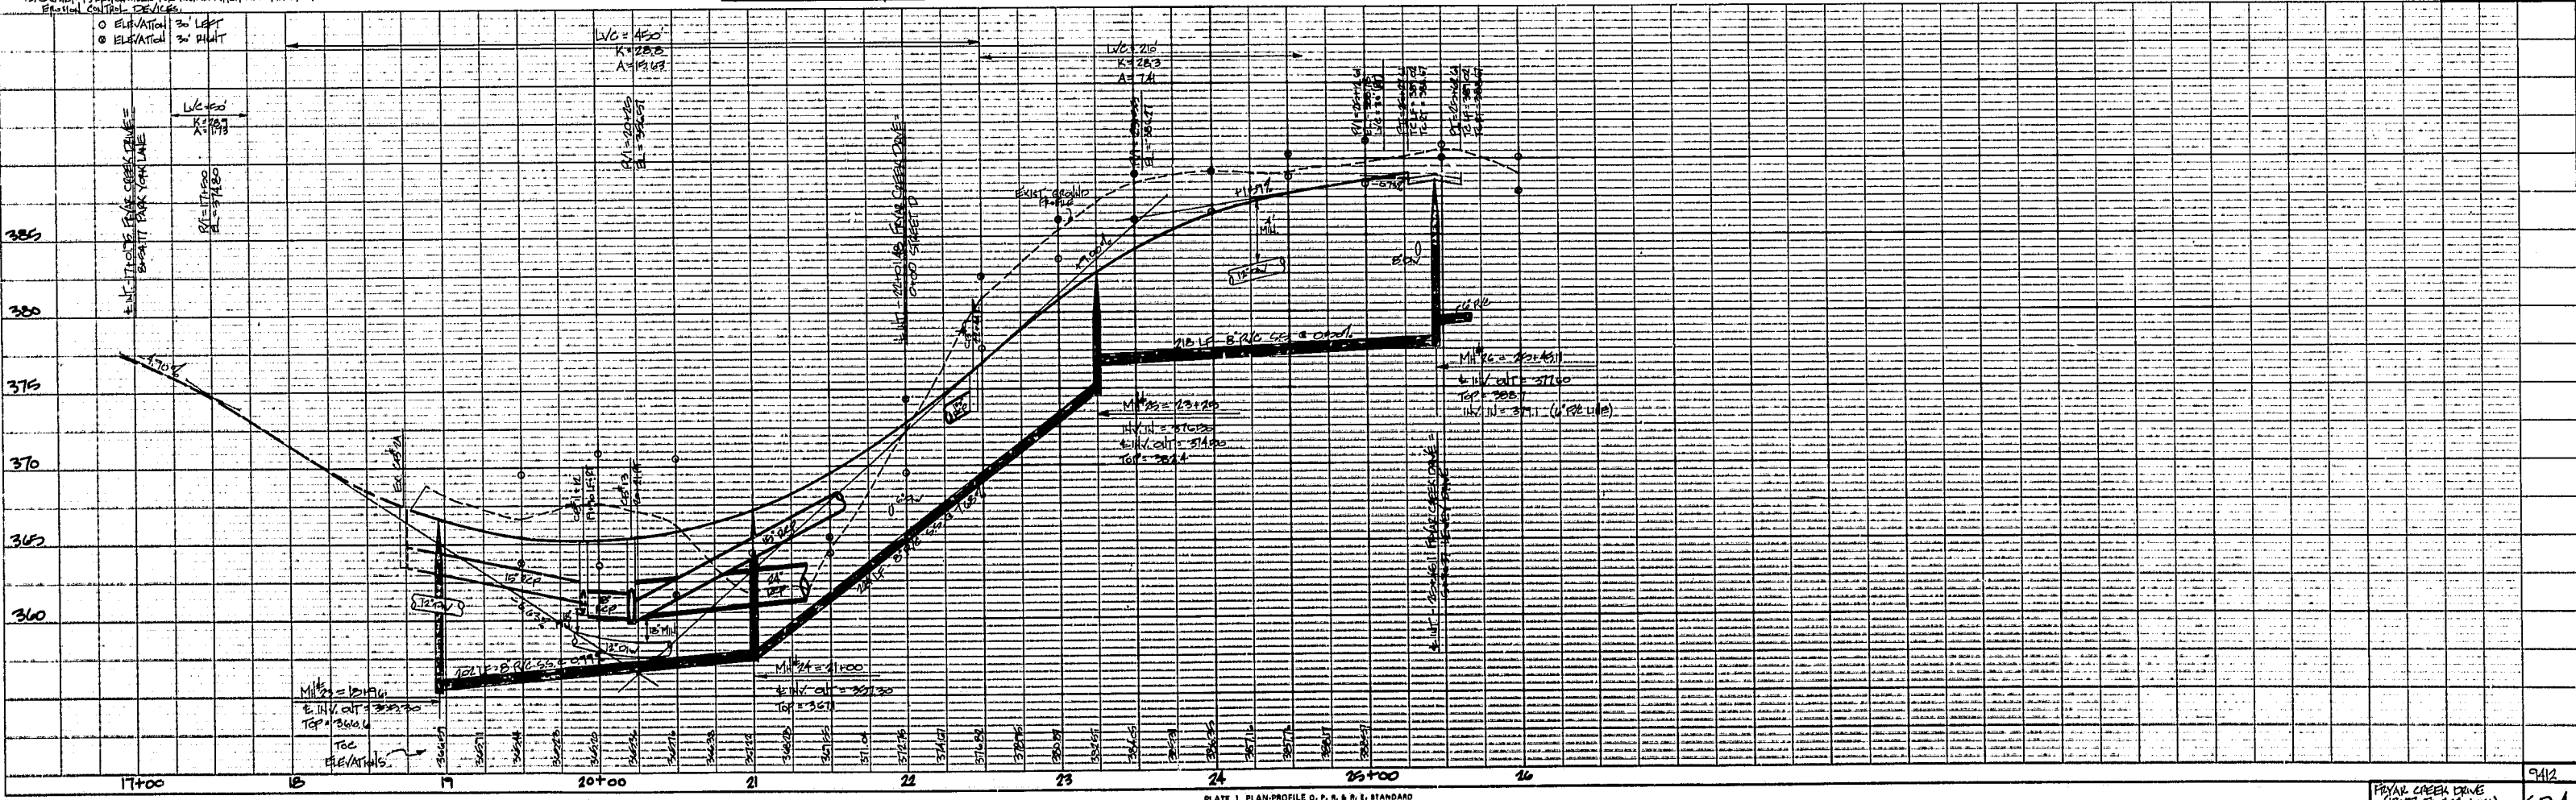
PLAN/PROFILE D.P. & R.I. STANDARD
